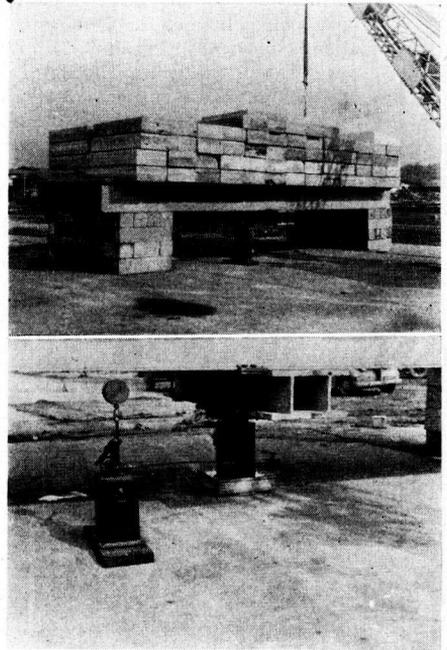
Photograph of the assembly used for applying static loads to pavements.
